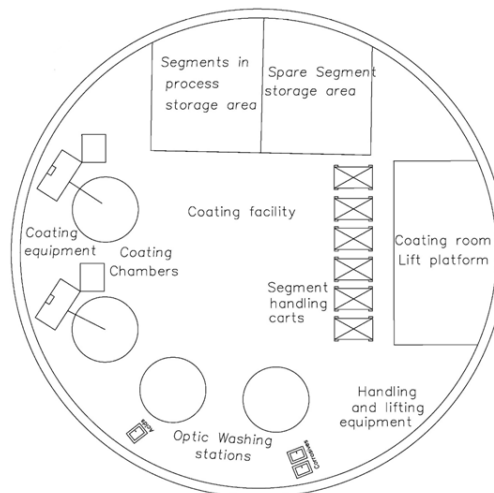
Magnified layout of the coating facility in the bottom level of the inner pier
